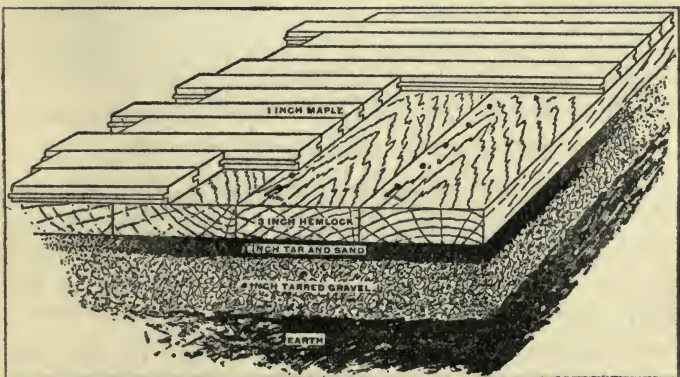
Figure III: Four layers built up as shown insure a moisture-proof, permanent shop floor
